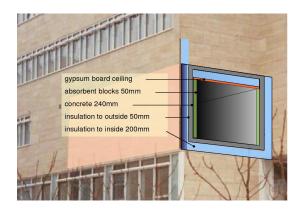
A section of the archive. Notice the thick insulation towards the interior and thin insulation to the outside!
